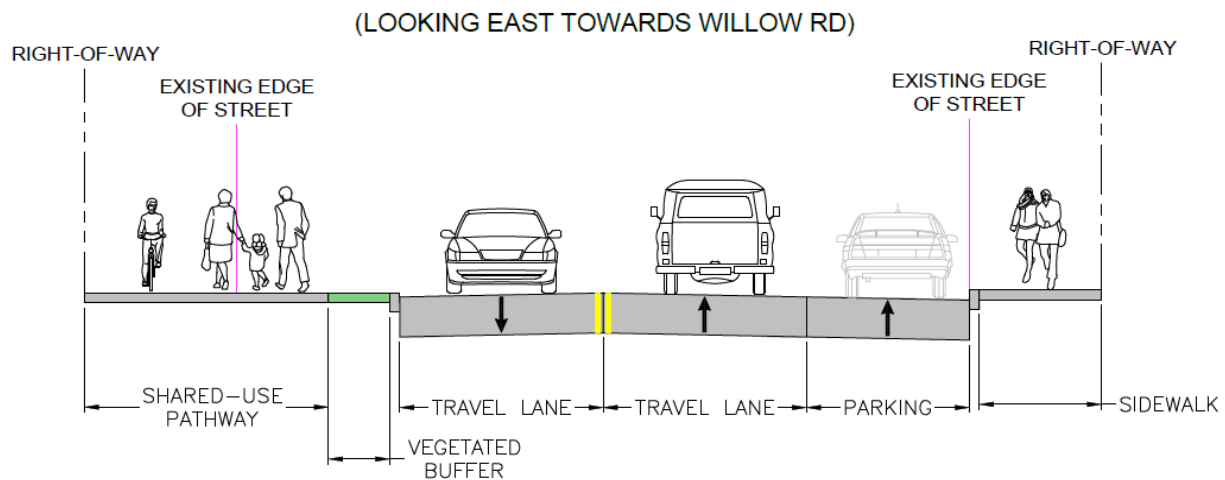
Coleman Avenue (City of Menlo Park) Long-term Alternative Cross Section Bicycle Boulevard with Shared Use Pathway and Parking on One Side
